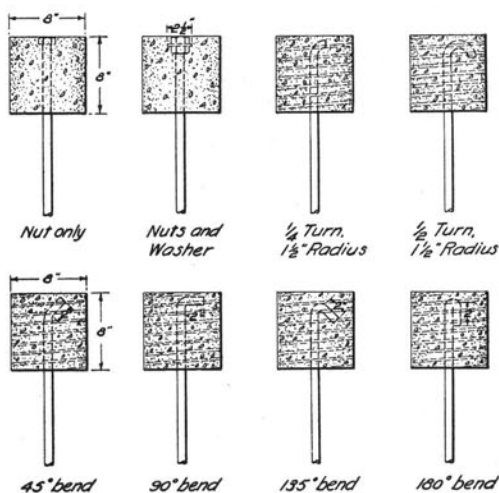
FORMS OF PULL-OUT SPECIMENS WITH ANCHORED BARS.
